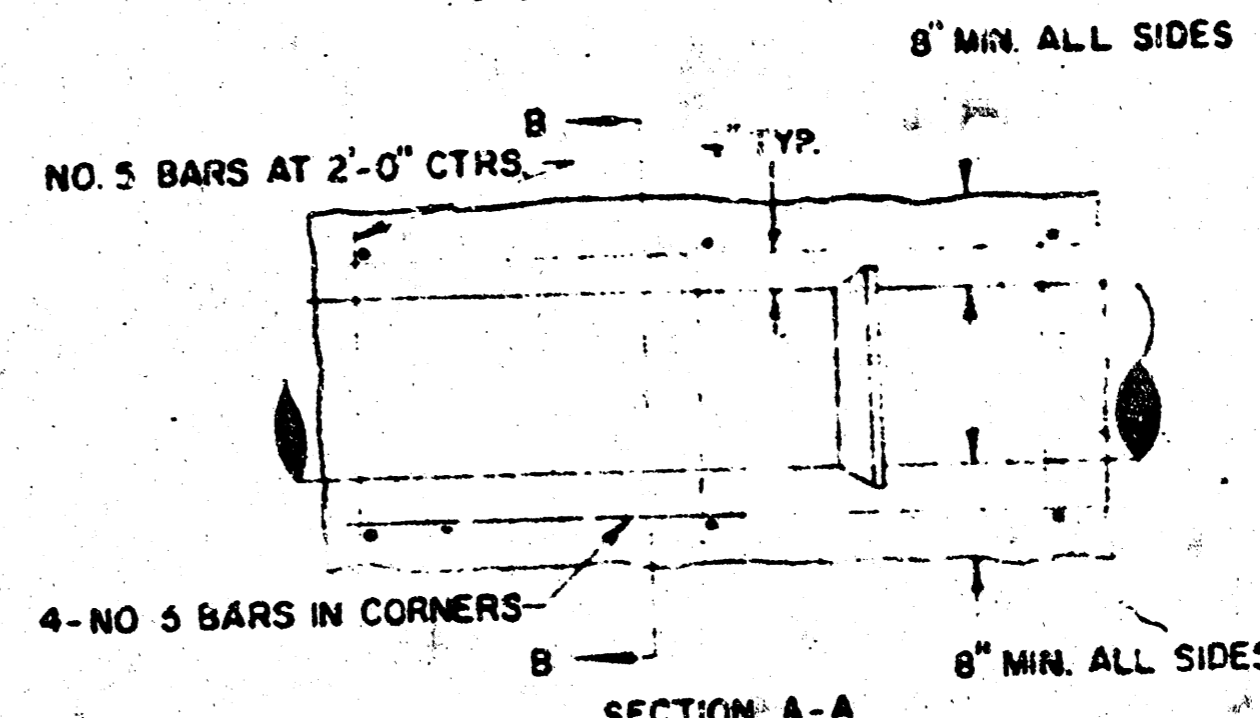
DETAIL OF DROP STACK FOR EXISTING MANHOLES IN GROUND WATER
